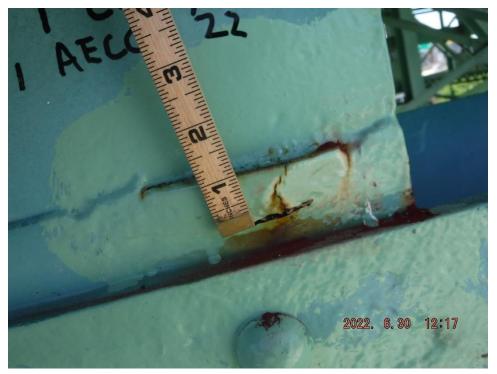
Cracked tack weld and fill plate with pack rust (Span 10, North Truss, L18, North Gusset shown)
